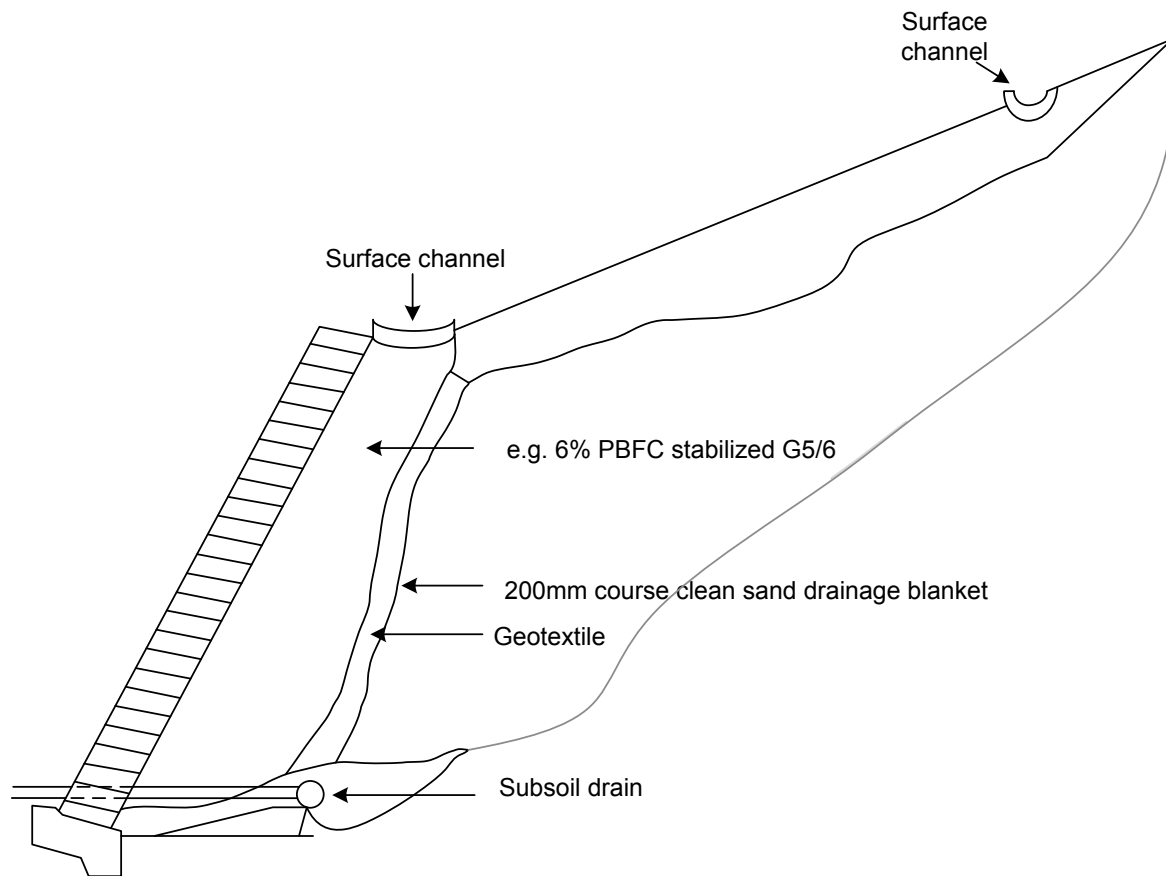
Subsoil drain in a conventional gravity CRB wall system (Clark, 2005)
